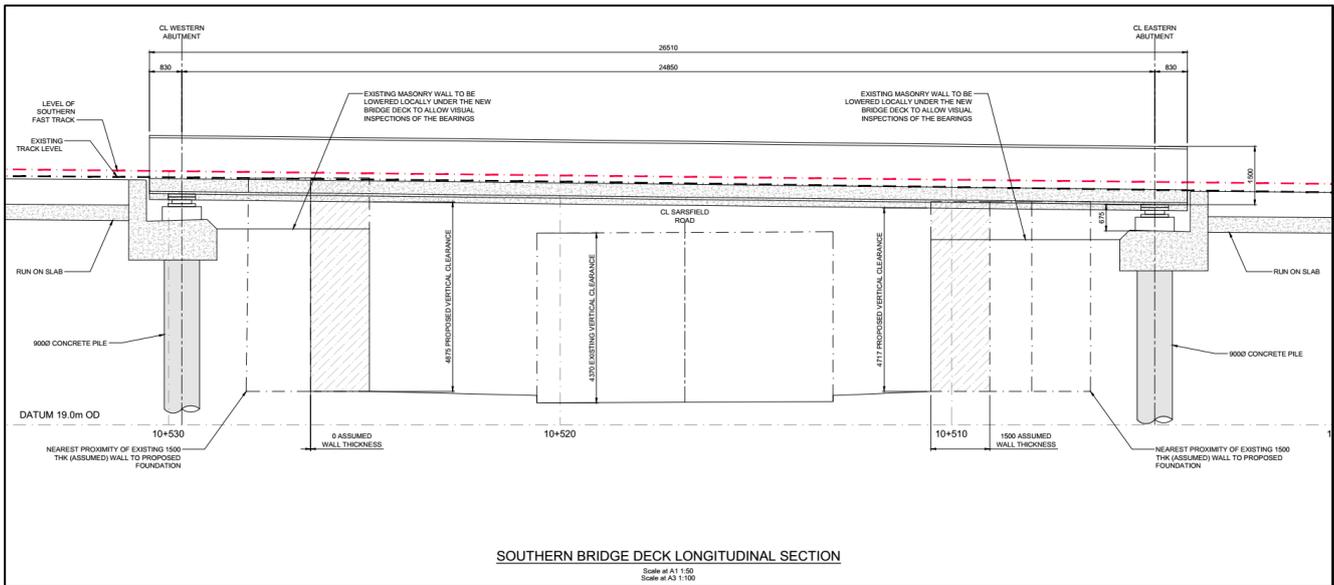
Sarsfield Road Bridge (UBC4) General Arrangement
